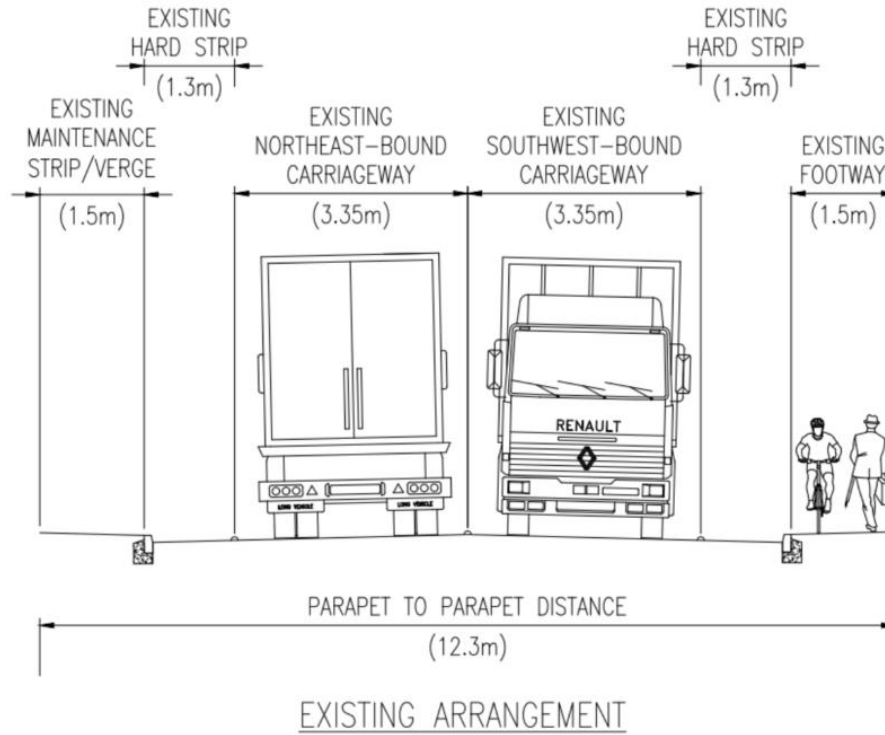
Extract from WSP’s Options Report showing existing cross section arrangement
